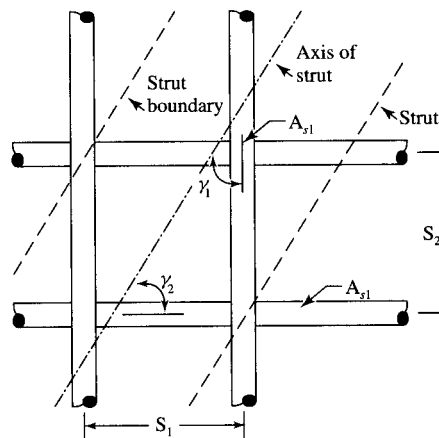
Reinforcing bars crossing a strut [1]. Courtesy of ACI 318-08.
